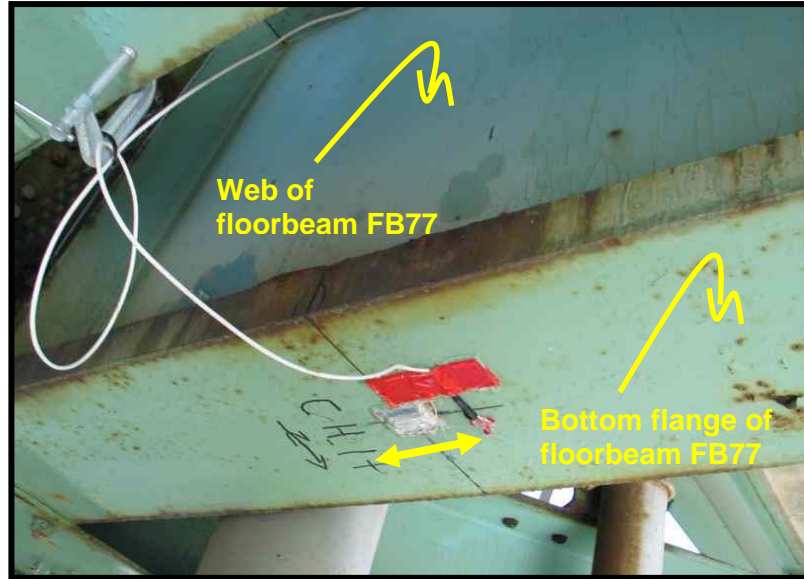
CH_17 installed on the bottom flange of floorbeam FB77 at the longitudinal stiffener to transverse stiffener detail (view looking north)
